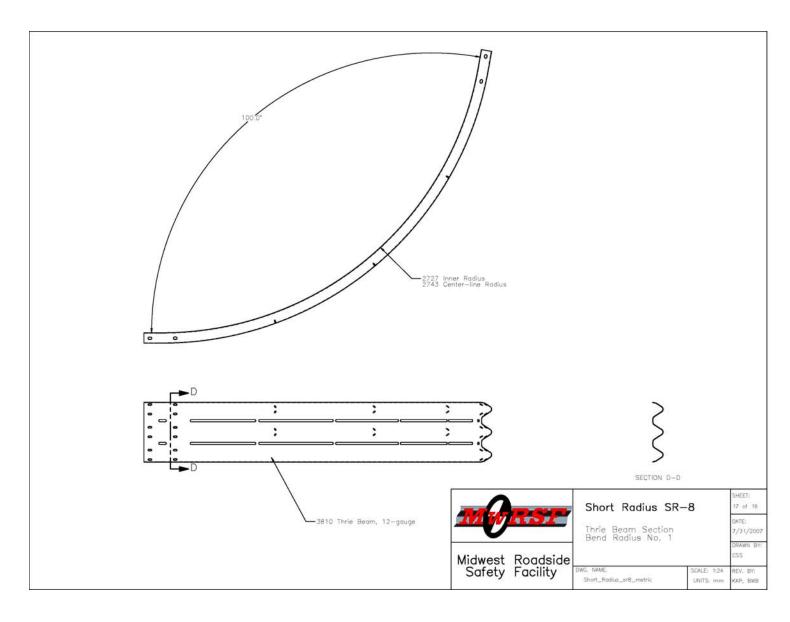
Thrie Beam Section, Bend Radius No. 1
